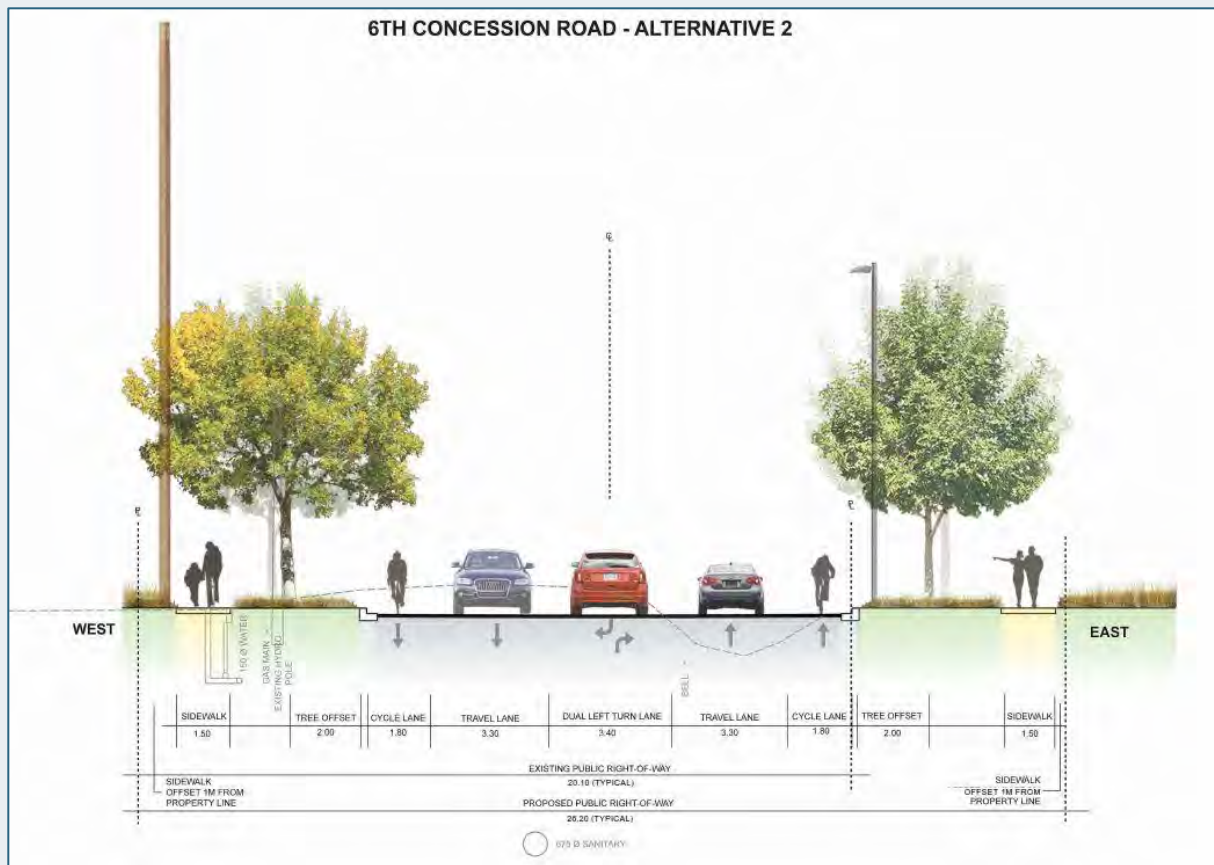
ALTERNATIVE 2 – SIXTH CONCESSION ROAD
